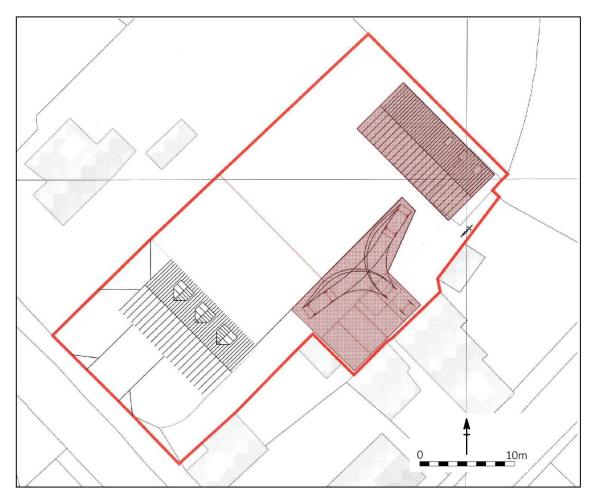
Development plan with the development areas highlighted (scale 1:400)
